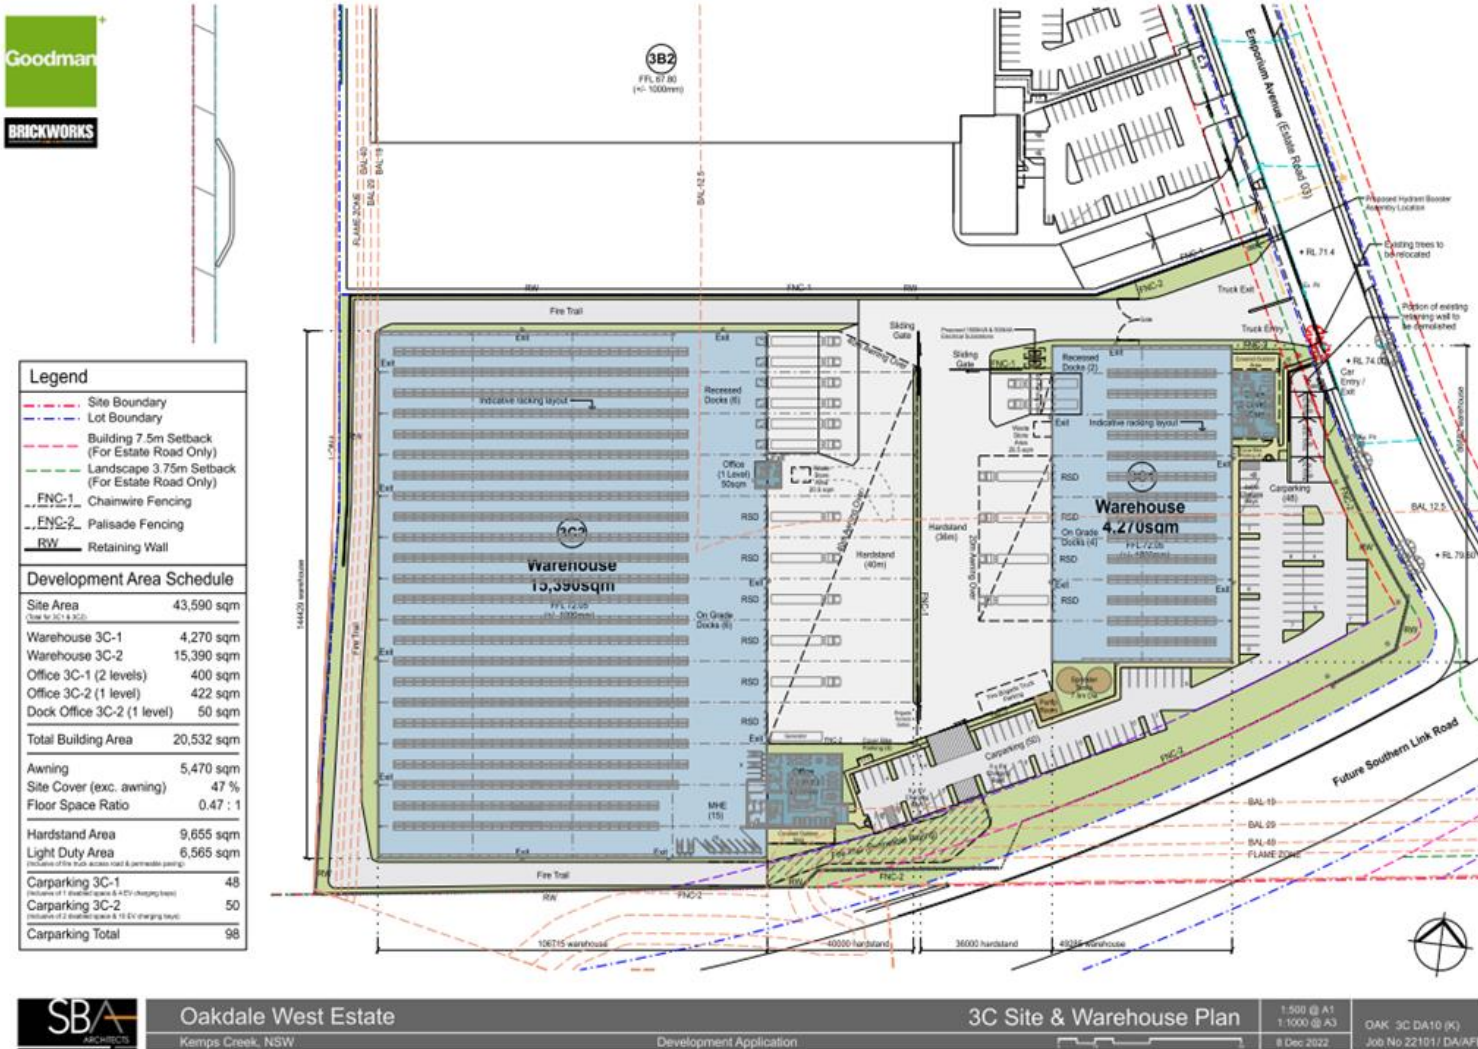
Building 3C1 and 3C2 Site and Warehouse Plan
